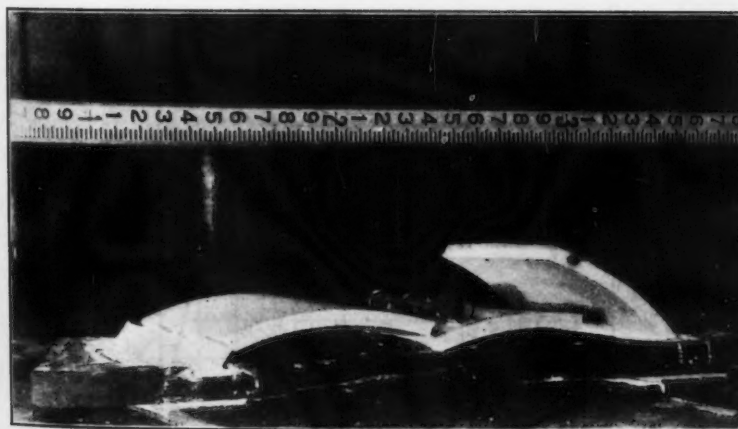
VIEW OF ARCH AFTER FAILURE.
